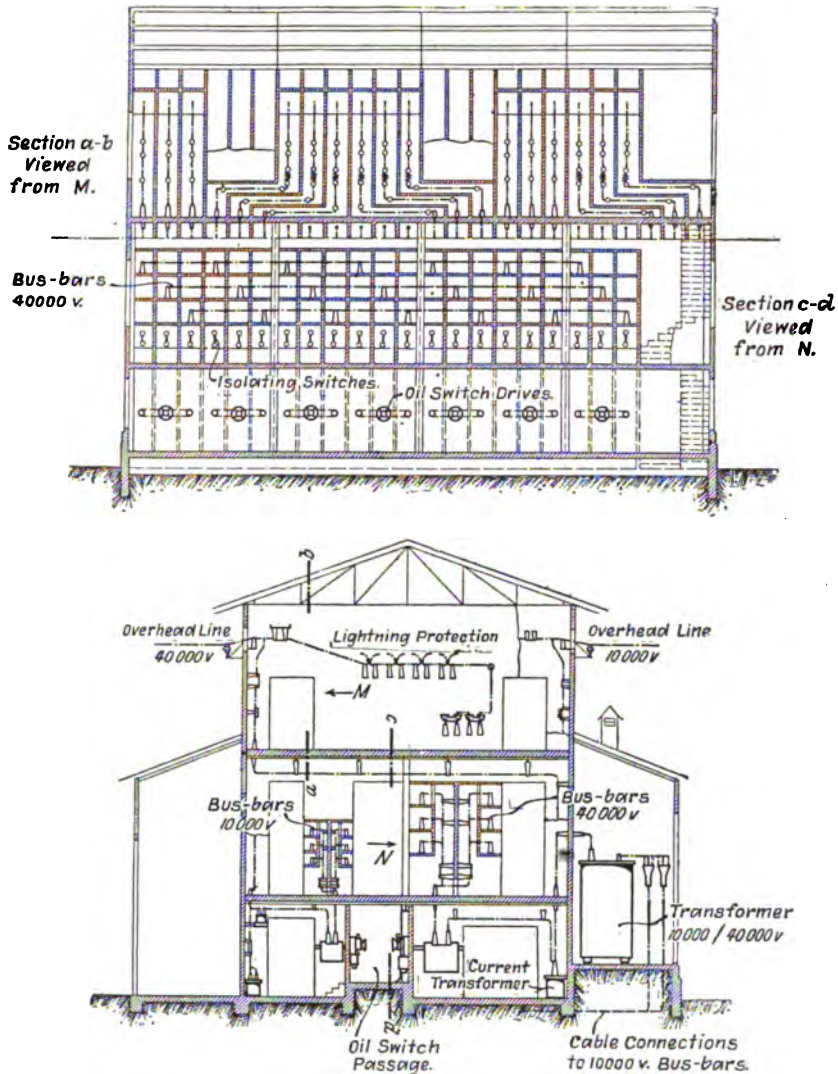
Hercules Substation. Cross and Longitudinal Sections.
